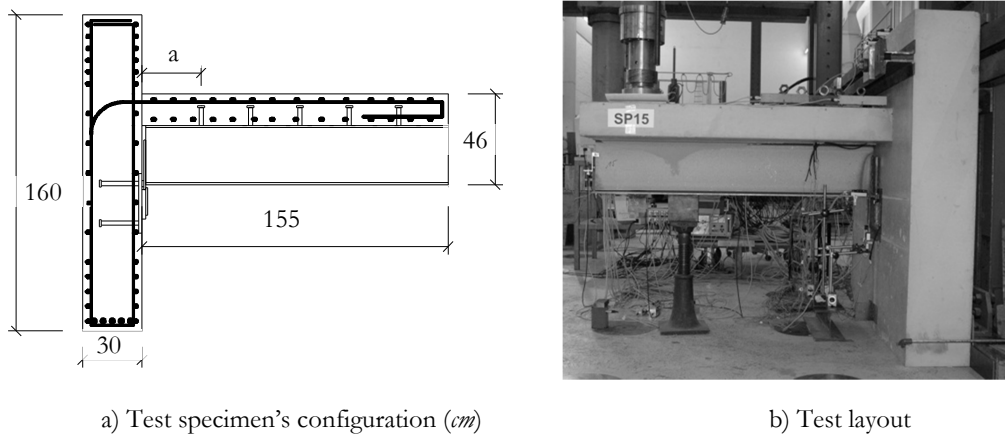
Experimental tests on composite beam to reinforced concrete wall joint (Henriques *et al.*, 2011)
